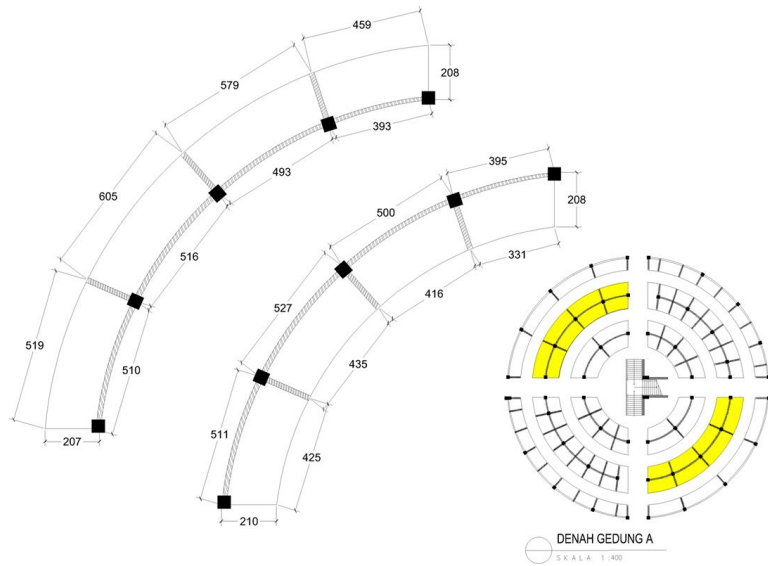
Two-Faced Four-Row Kiosk Layout Block 2 (Building A) (source: author)
